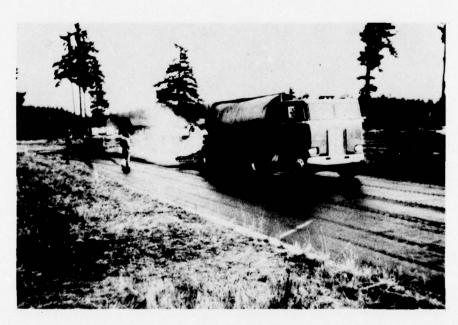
Fort Lewis--application of Sahuaro asphalt-rubber mixture on Faith Avenue
